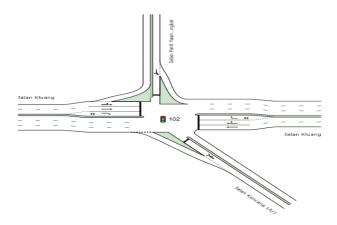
Layout Plan of Signalized Intersection in SIDRA Version 8.0
